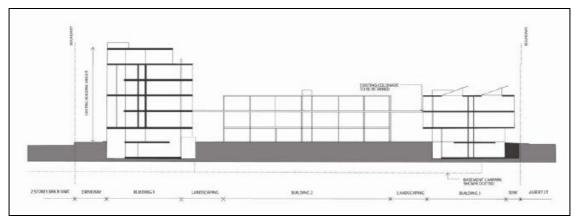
Section drawing through Buildings 1, 2 and 3 of approved concept plan
